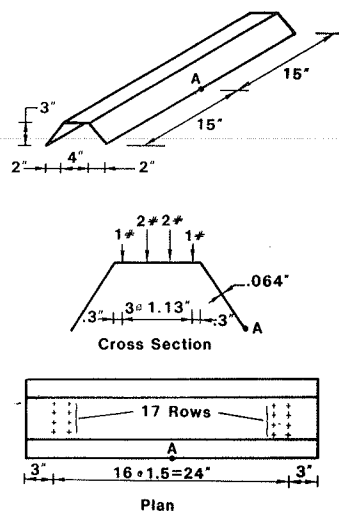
Example 1: single-span folded-plate structure with loading.
